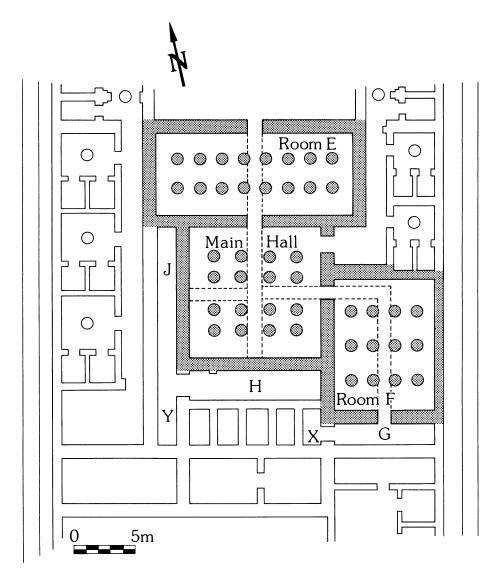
Plan of the Main Hall and rooms E and F with painted pavements, connected by a pathway of captives.. Several surrounding rooms also contained floor paintings.
